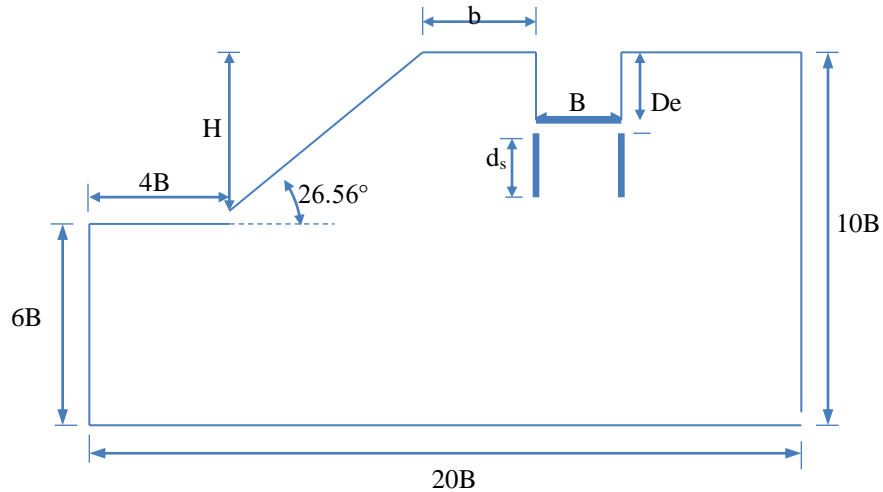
Geometry Model of Skirted Strip Footing adjacent to Unsupported Slope
